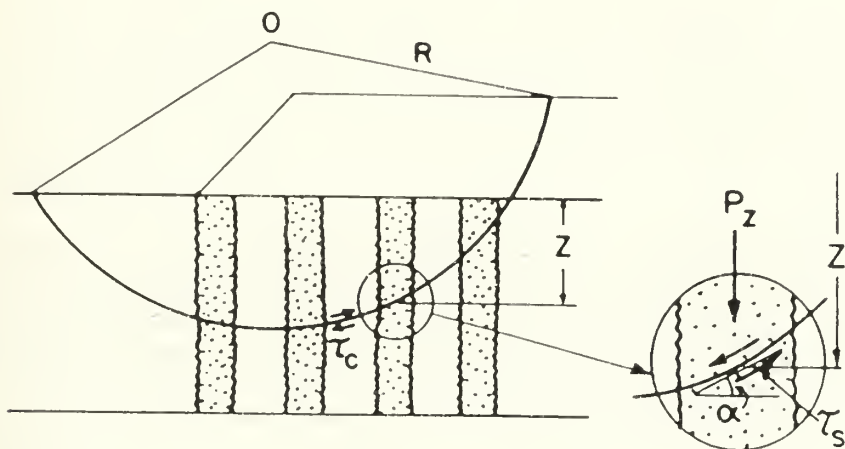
Stone columns used for slope stability. (Mitchell, 1981)
